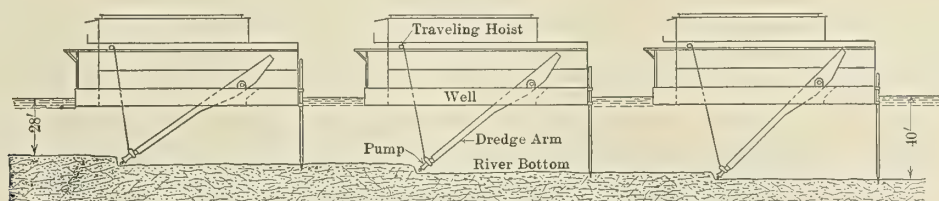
ARRANGEMENT OF DREDGES FOR DEEPENING A CHANNEL.
